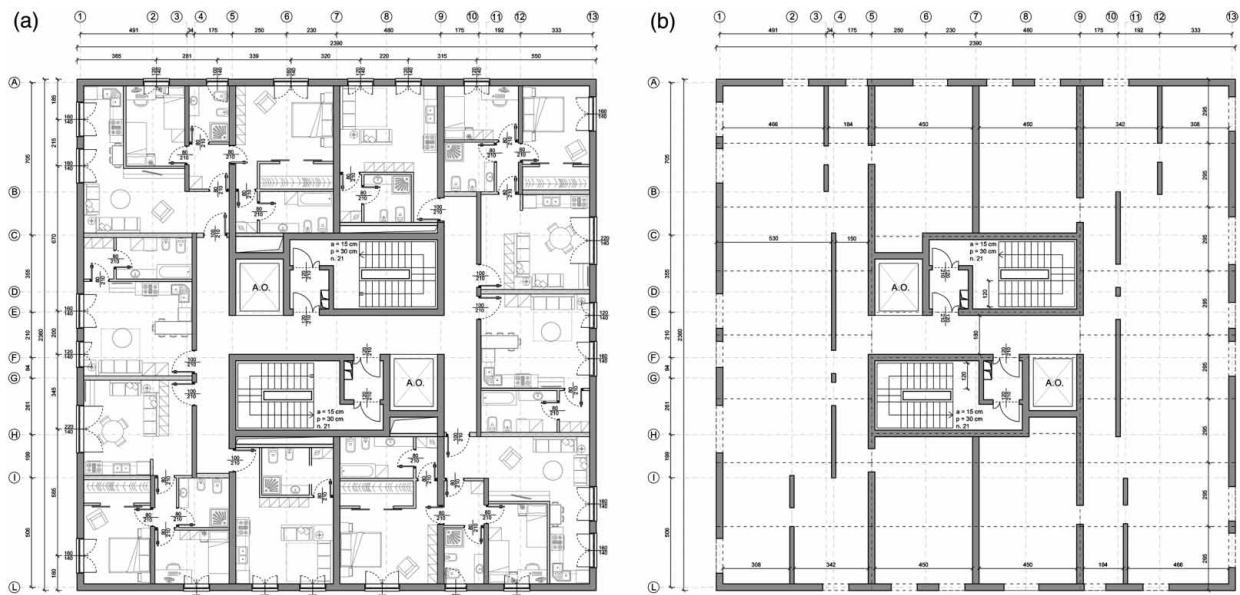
(a) Typical floor layout. (b) Typical floor structural layout.
